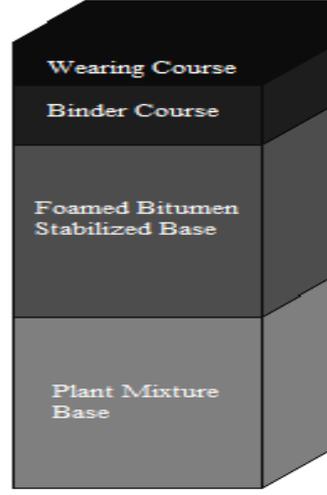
Recommended pavement cross section for cold in-place recycling with foam bitumen
